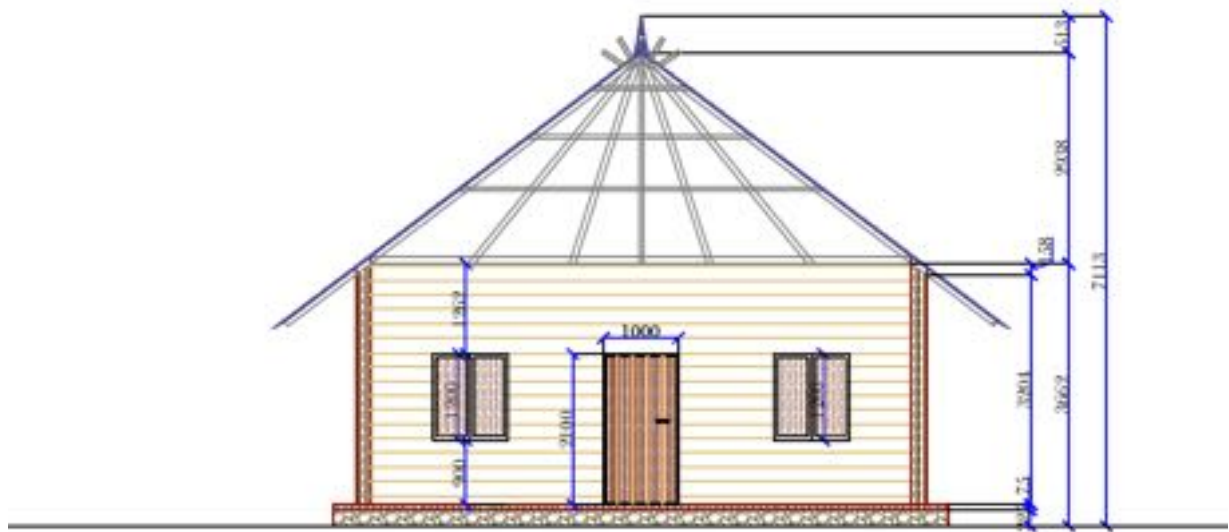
Cross section of the building plan (prototype, with measurements in mm).
